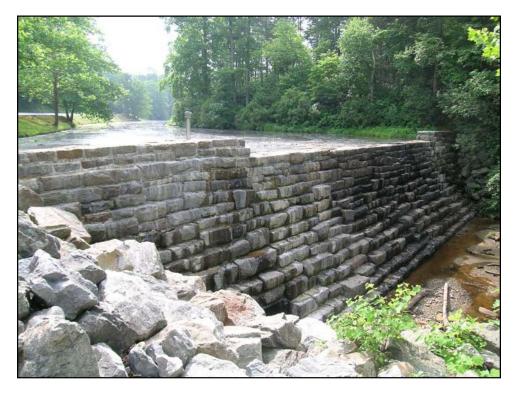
Grouting complete. Outlet works slide gate closed with the lake just starting to pass over the spillway crest (June 29, 2005).
